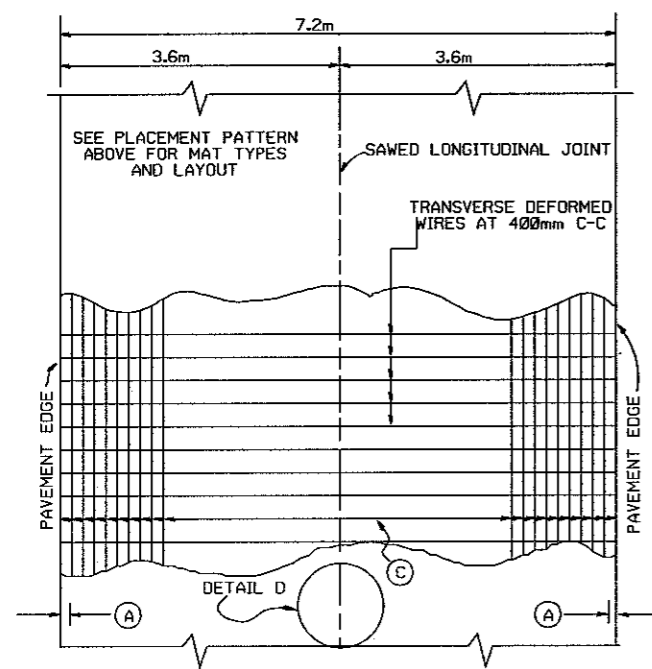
DETAILS OF CONCRETE PAVEMENT CONTINUOUSLY REINFORCED
